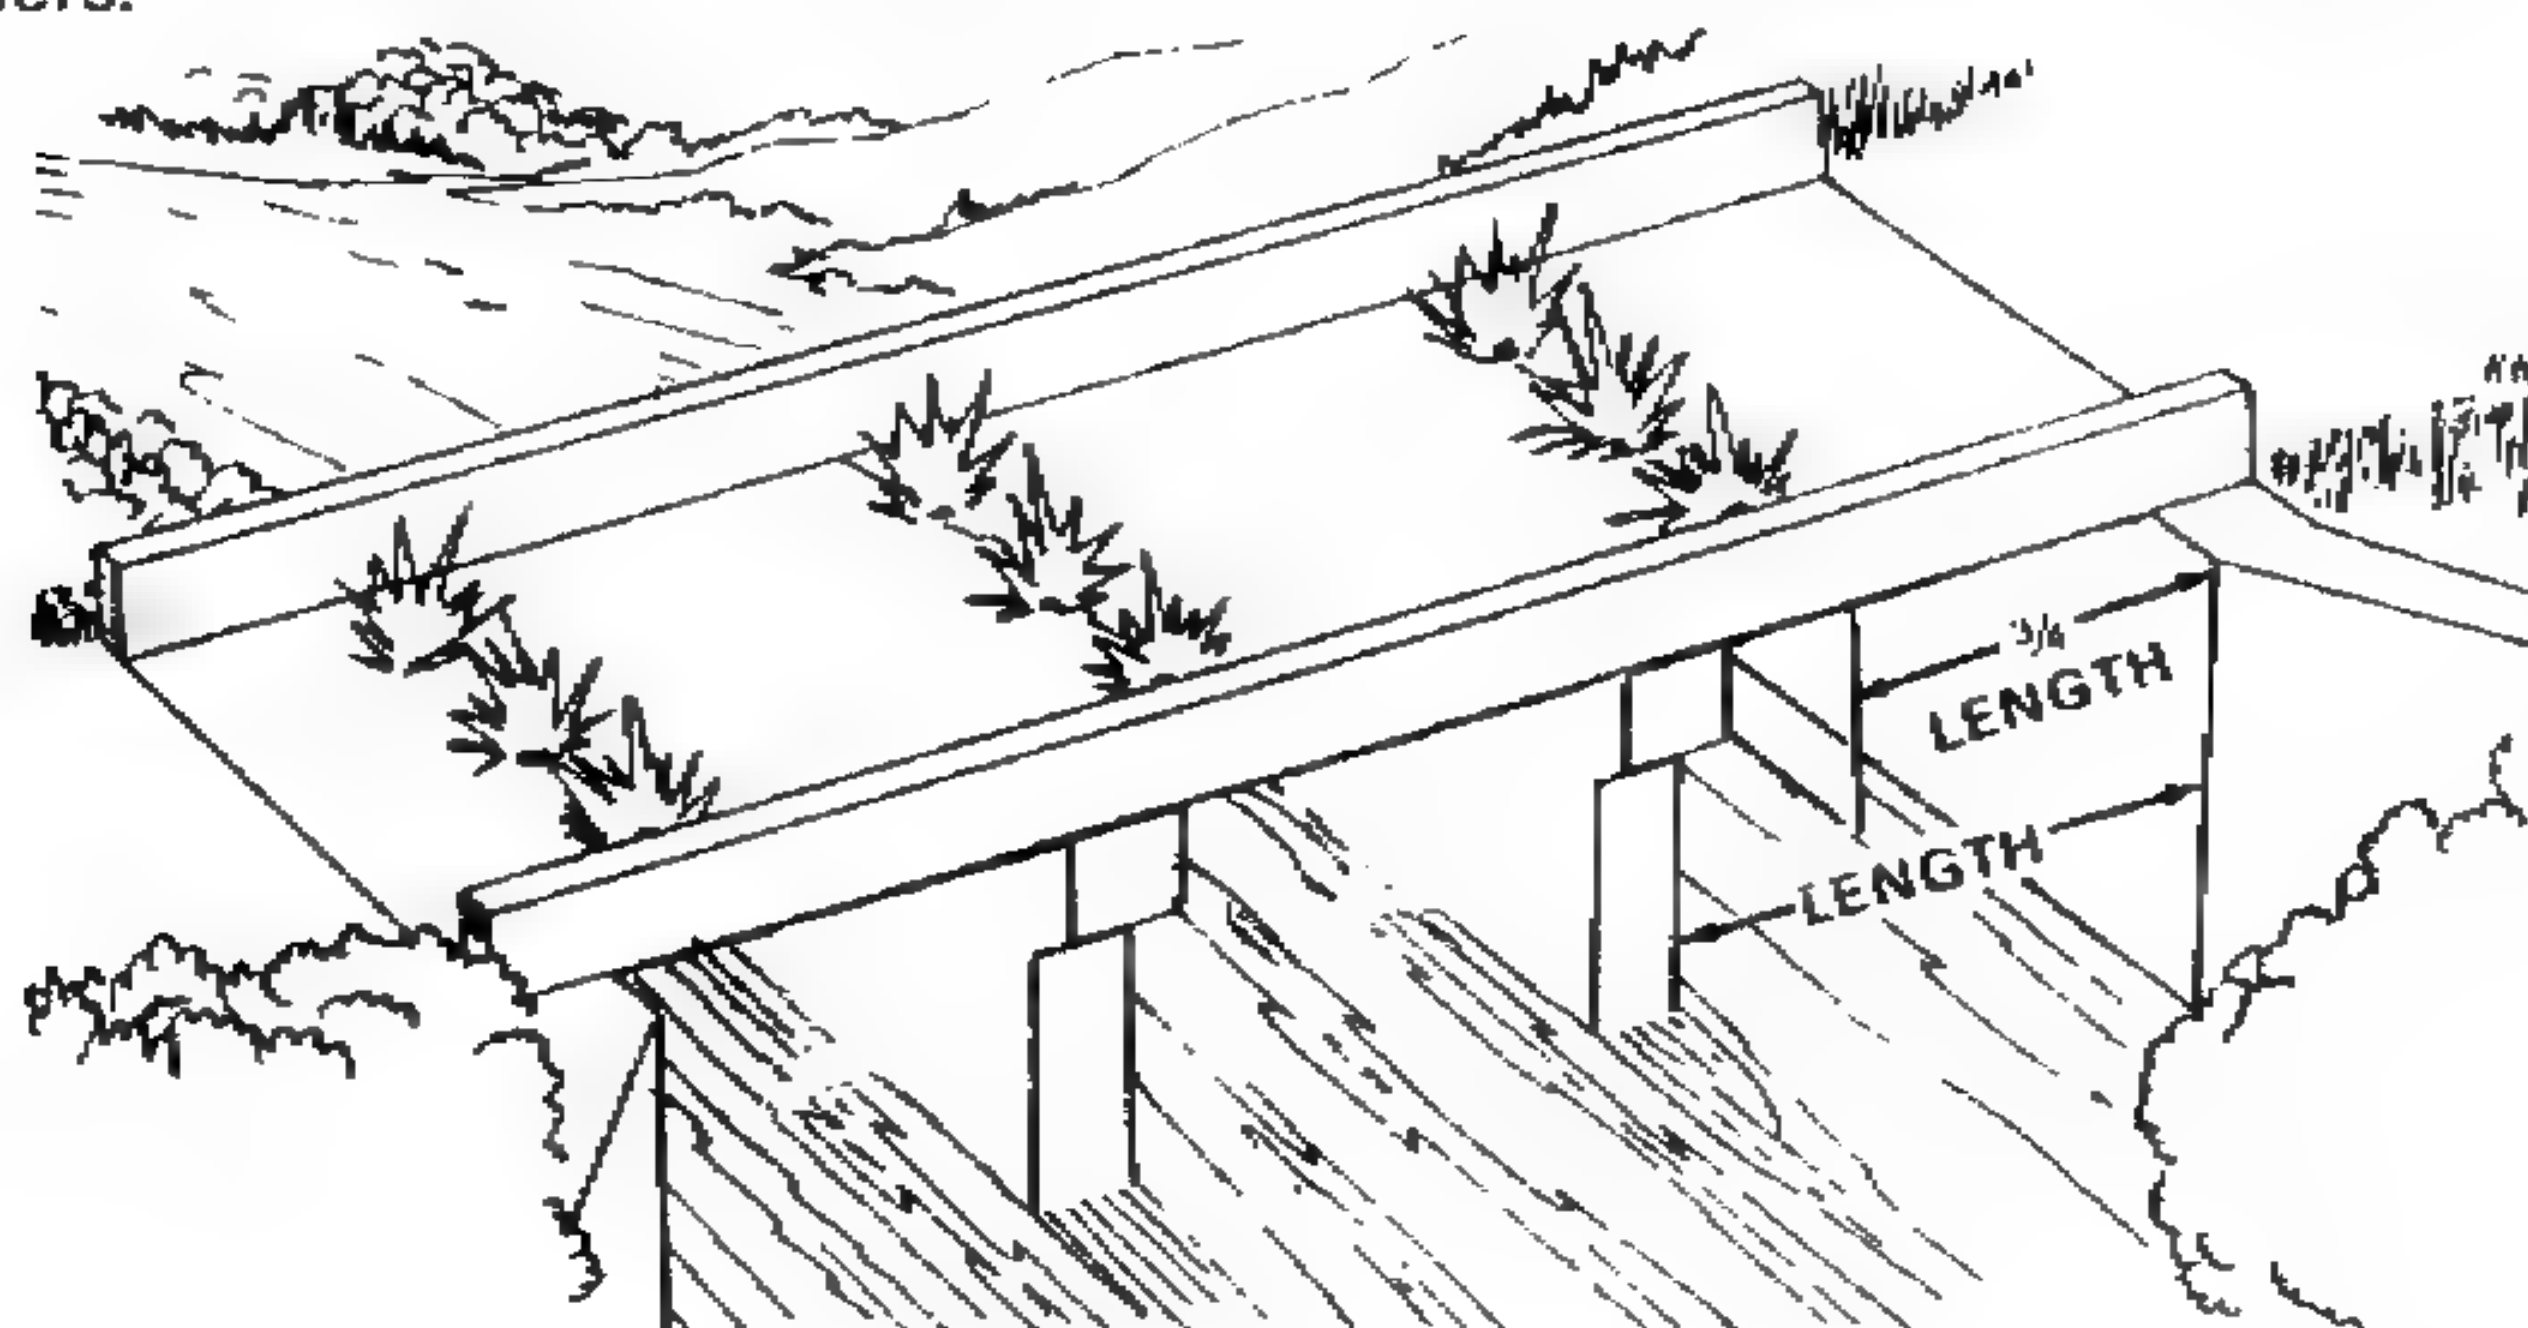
Complete destruction of continuous-span concrete-slab bridge
